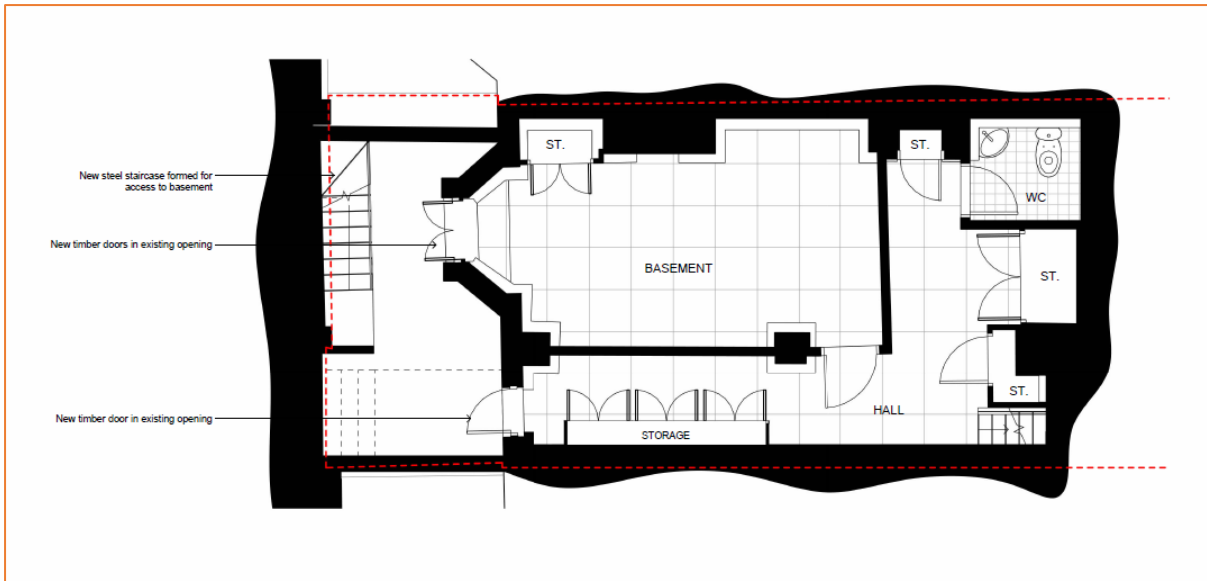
Proposed Basement Floor Plans (Source: Gresford Architects)
